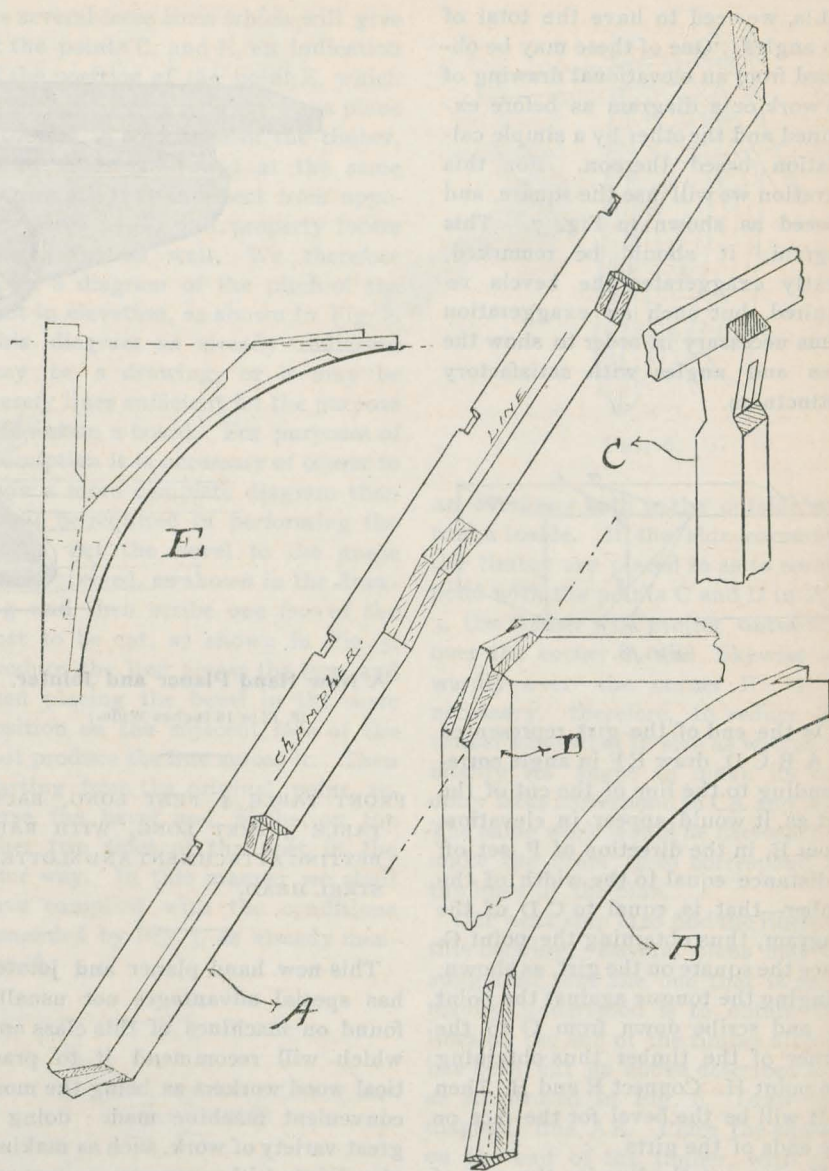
CONSTRUCTIVE FRAMING OF ROOF.
